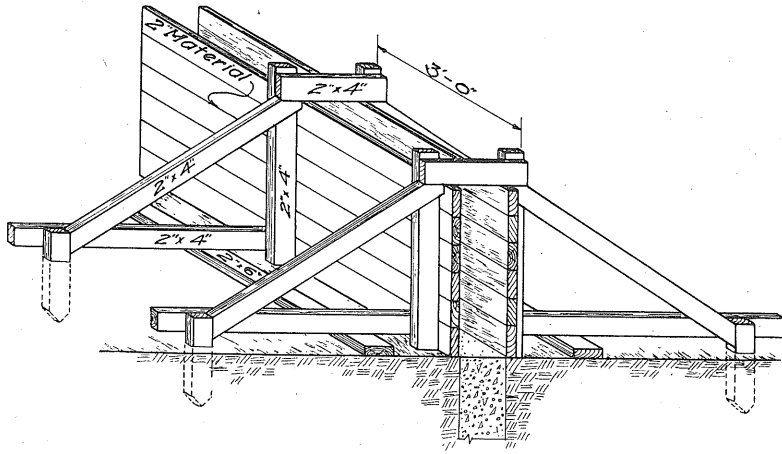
A FORM FOR BUILDING A CONCRETE WALL
